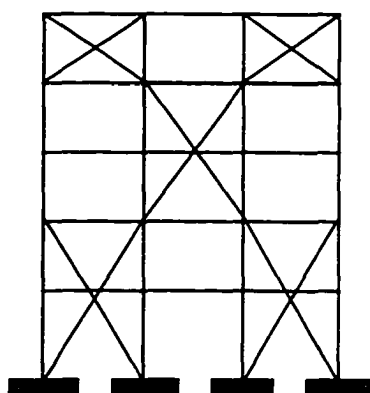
Concentric-X steel bracing schemes for the three story R/C building prototype.
